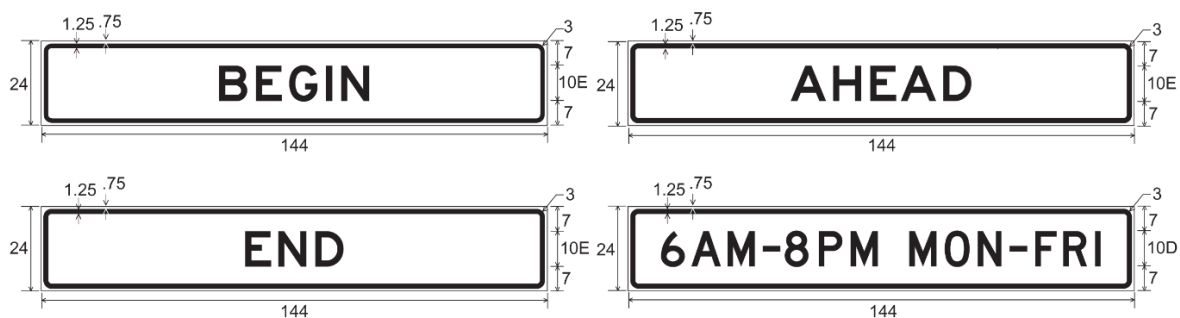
Plaque details for overhead left lane truck restriction sign
